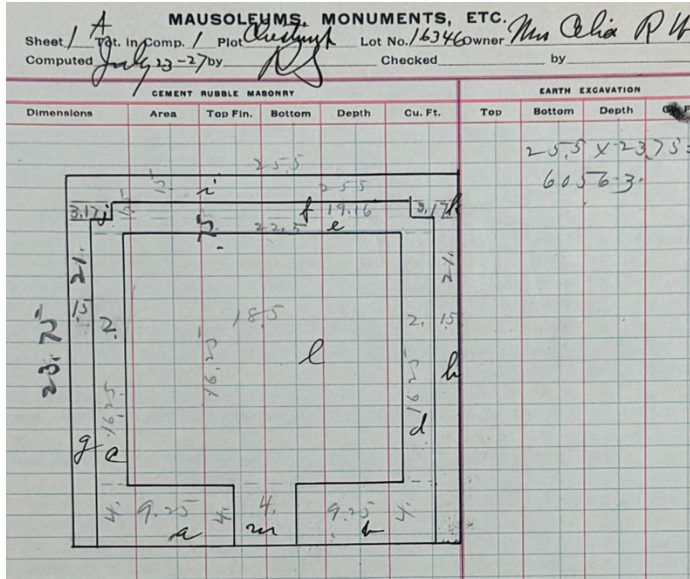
, Foundation Plan, Avery Drawings and Archives Collection
